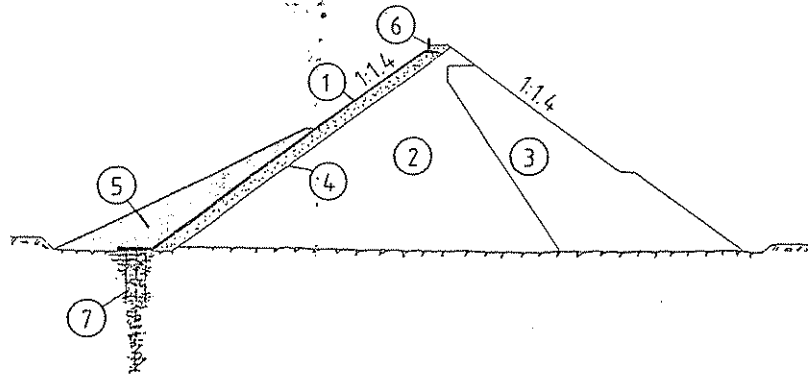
Typical section of a concrete face rockfill dam (scheme).
